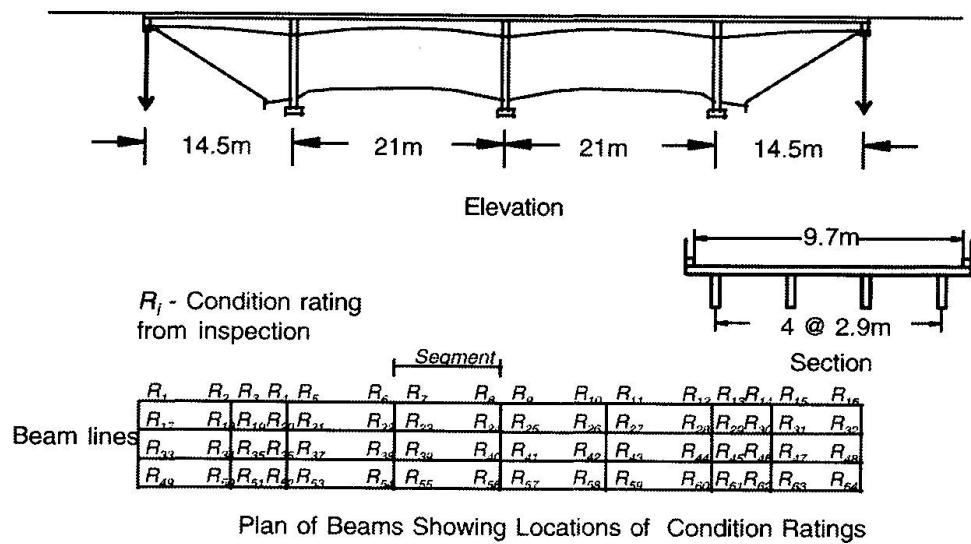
Beam Segments for Reinforced Concrete Bridge
